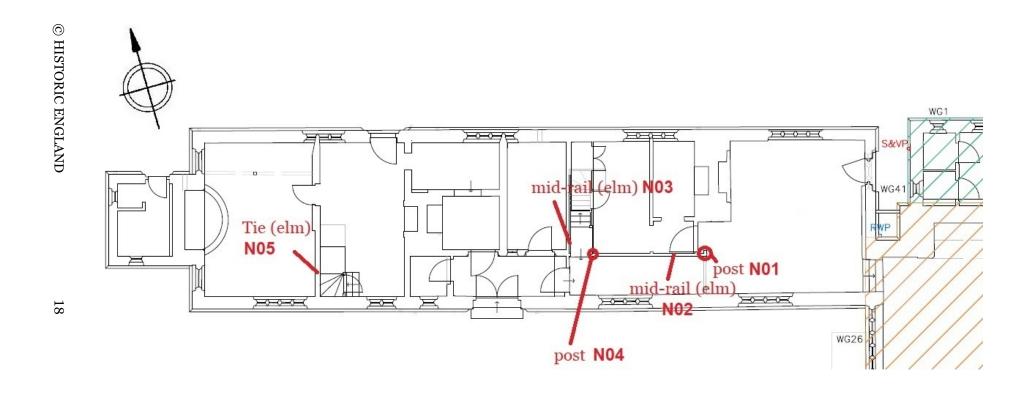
Plan of the ground floor of the north-west range, showing the locations of the timbers sampled for dendrochronology (adapted from an original drawing by The Morton Partnership)
